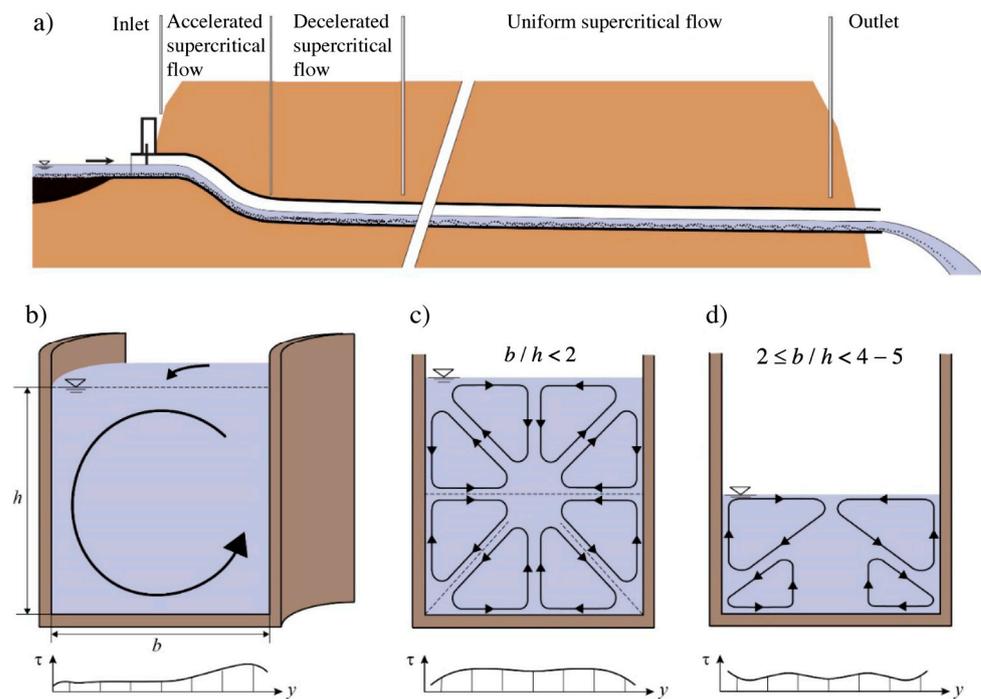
(a) Typical longitudinal section of SBT, and cross-section of SBT flow with Prandtl's secondary current of (b) first kind occurring at tunnel bends, and (c,d) second kind occurring in a straight tunnel section with (c) $b/h < 2$ and (d) $2 \leq b/h < 4$ to 5.
